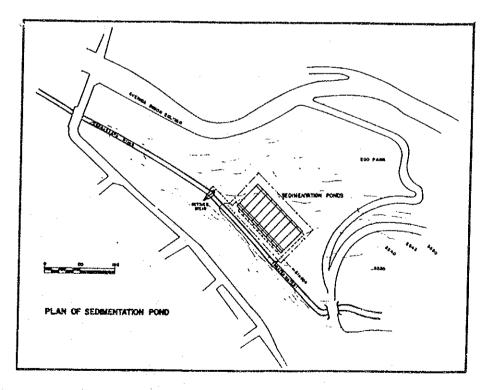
PLAN OF SEDIMENTATION PONDS
